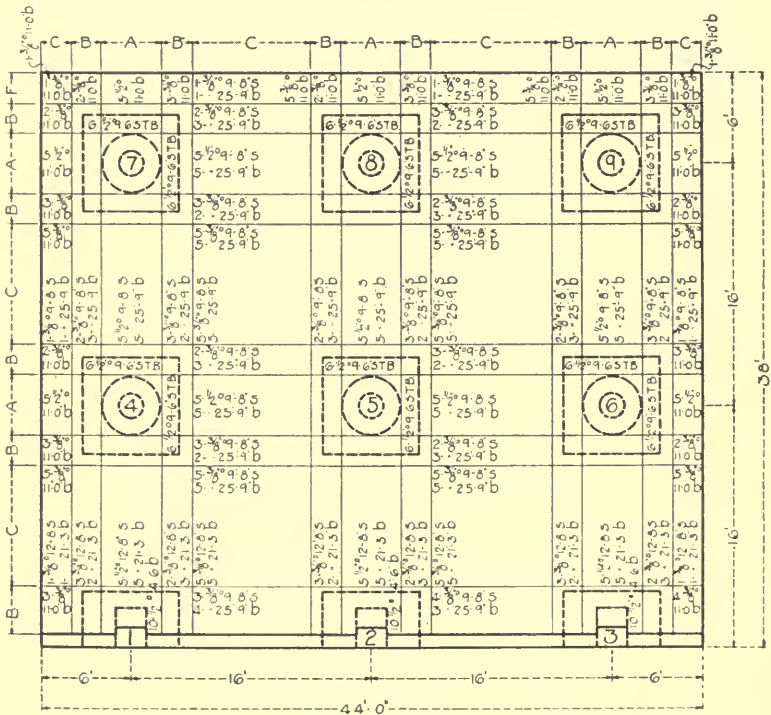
REINFORCING PLAN FOR SLAB J.
